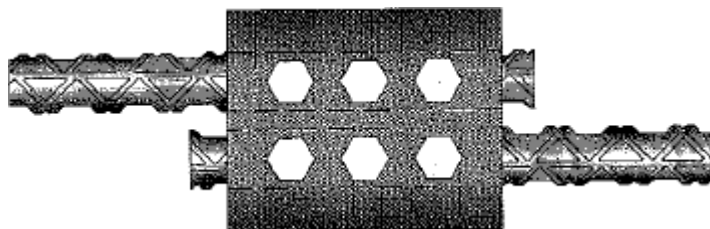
Typical Mechanical Coupler for Reinforcing Steel
